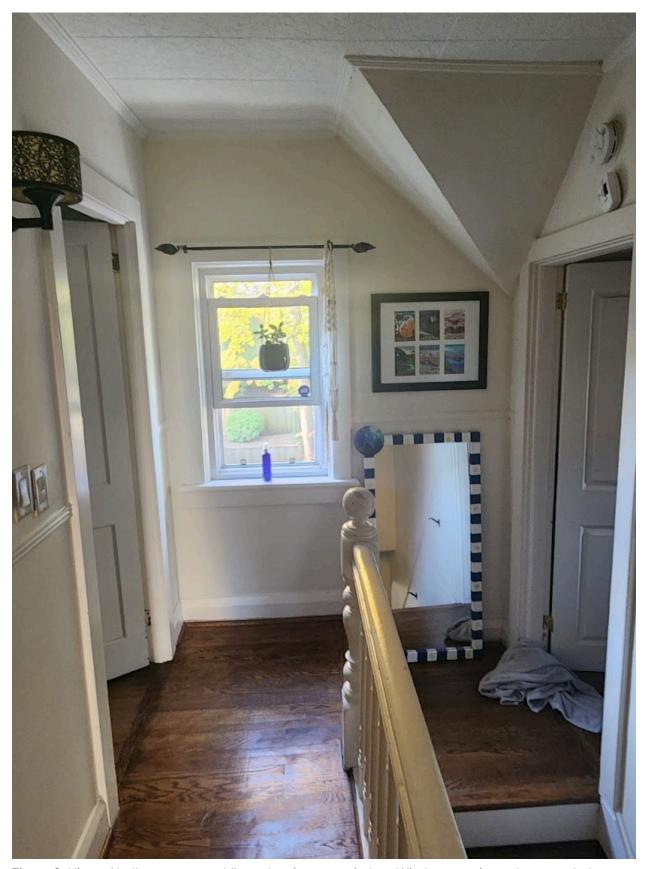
View of hallway at second floor showing rear window. Window opening to be extended to floor to accommodate access to new primary bedroom. (Photo by owner, October 2024)
